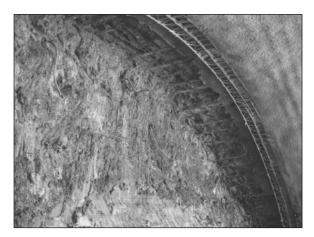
Top heading face shortly after excavation with exposed pre-support pipes
